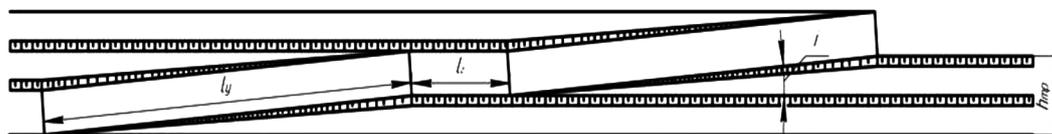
Scheme of the trail of auto transport with a horizontal section
